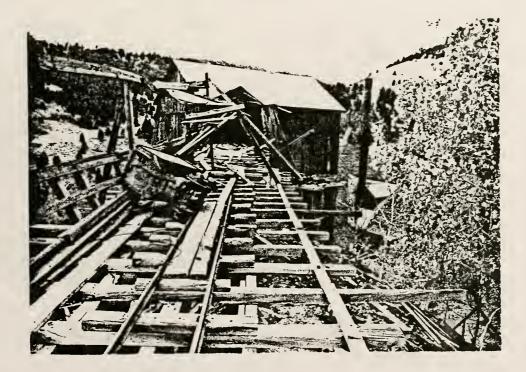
Revenue Mill (structure #34), west view of tramway entering upper level of mill.
